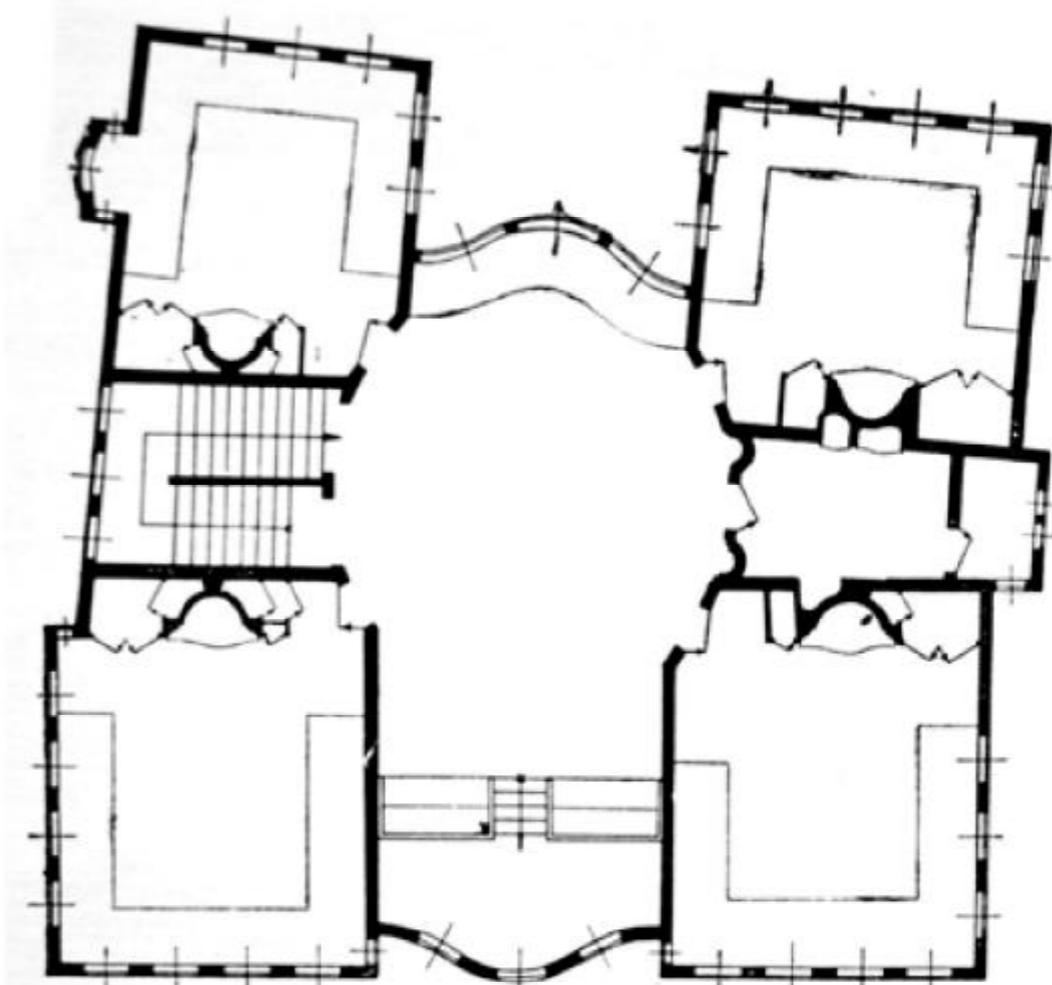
Dimitar Georgiadi House. Street façade [8], first floor plan.
